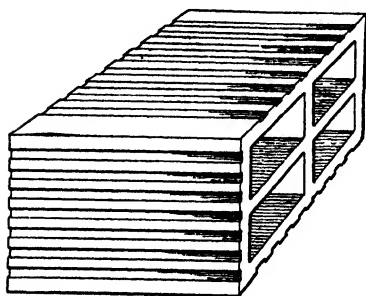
Typical Hollow Clay Floor Tile. (See p. 590.)
